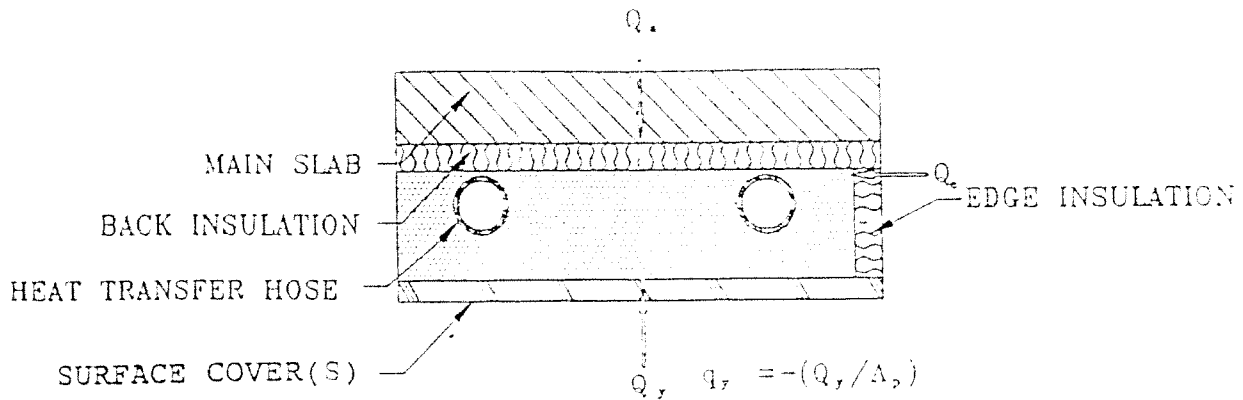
In-slab Type Ceiling Cooling Panel Construction.
